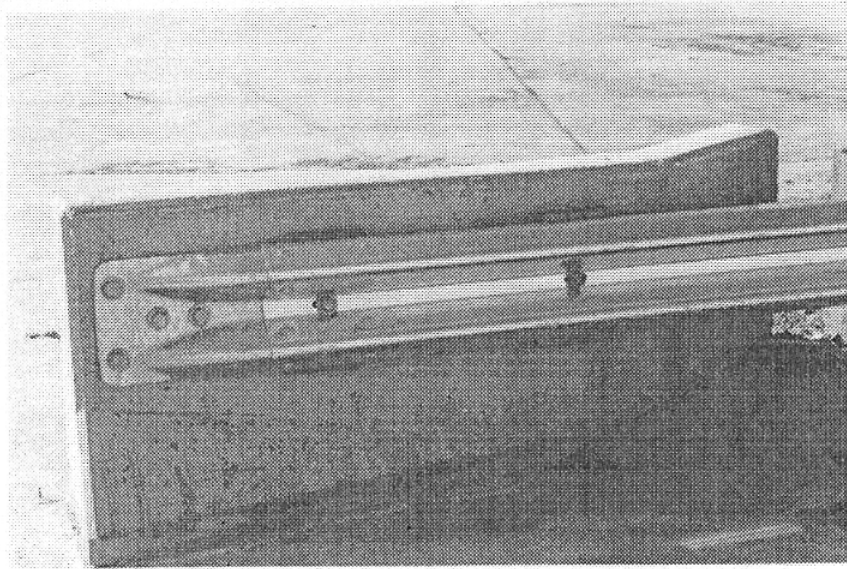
PHOTOGRAPHS OF W-BEAM GUARDRAIL APPROACH
